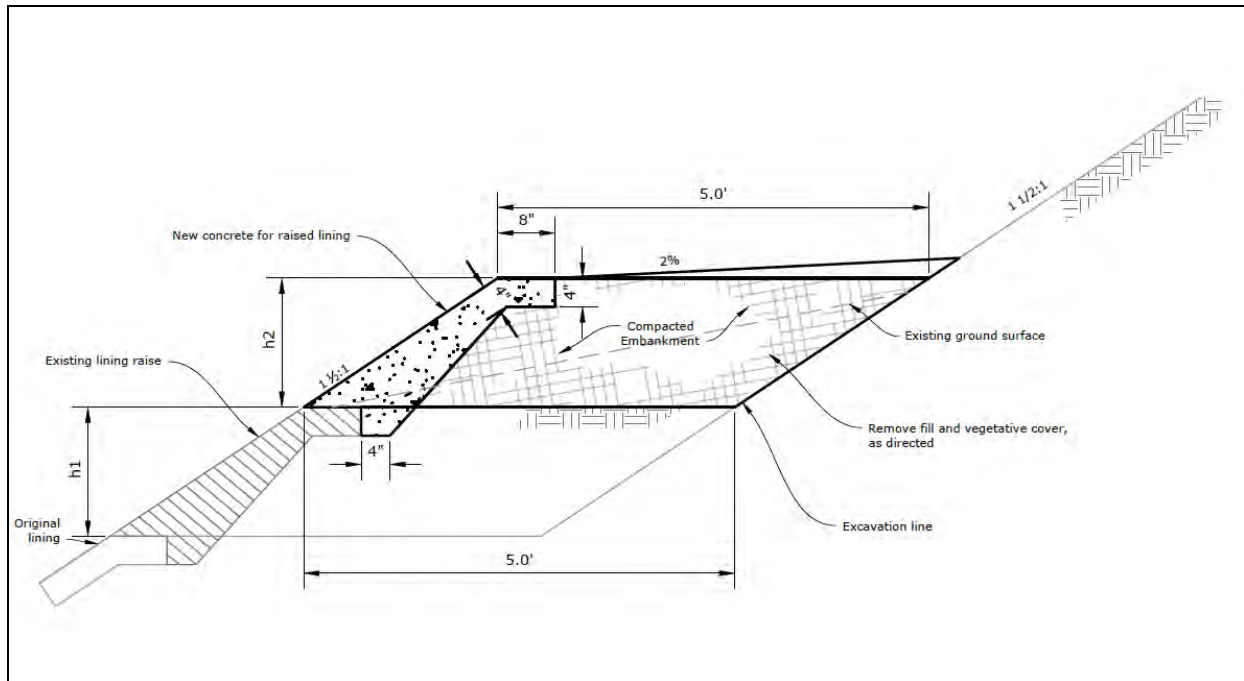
DMC typical cross section showing placement of original concrete lining, previous lining raise, and proposed lining raise.
